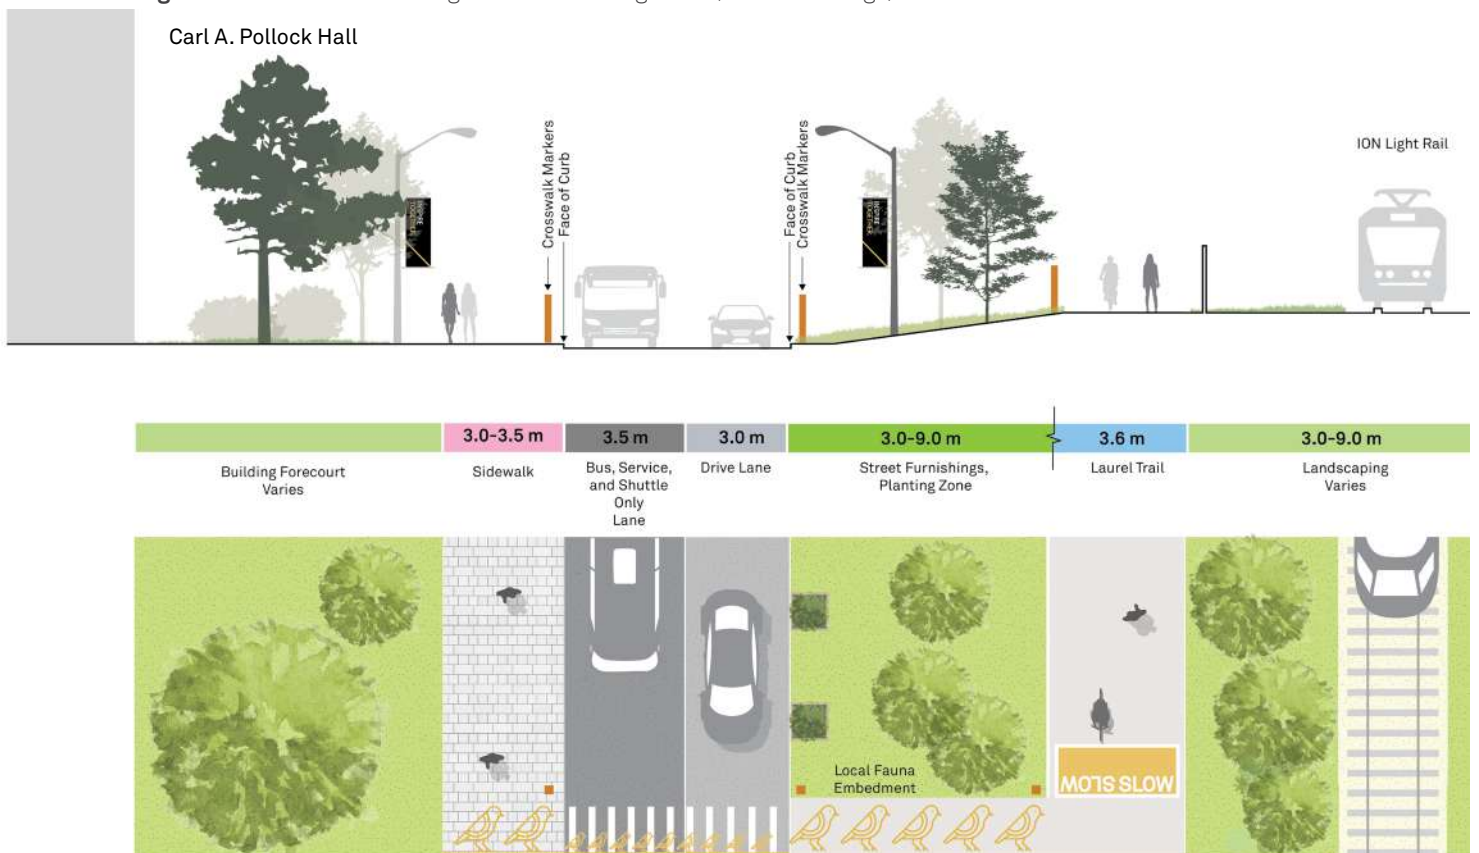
Section E. Proposed condition of Ring Road (southeast edge).
